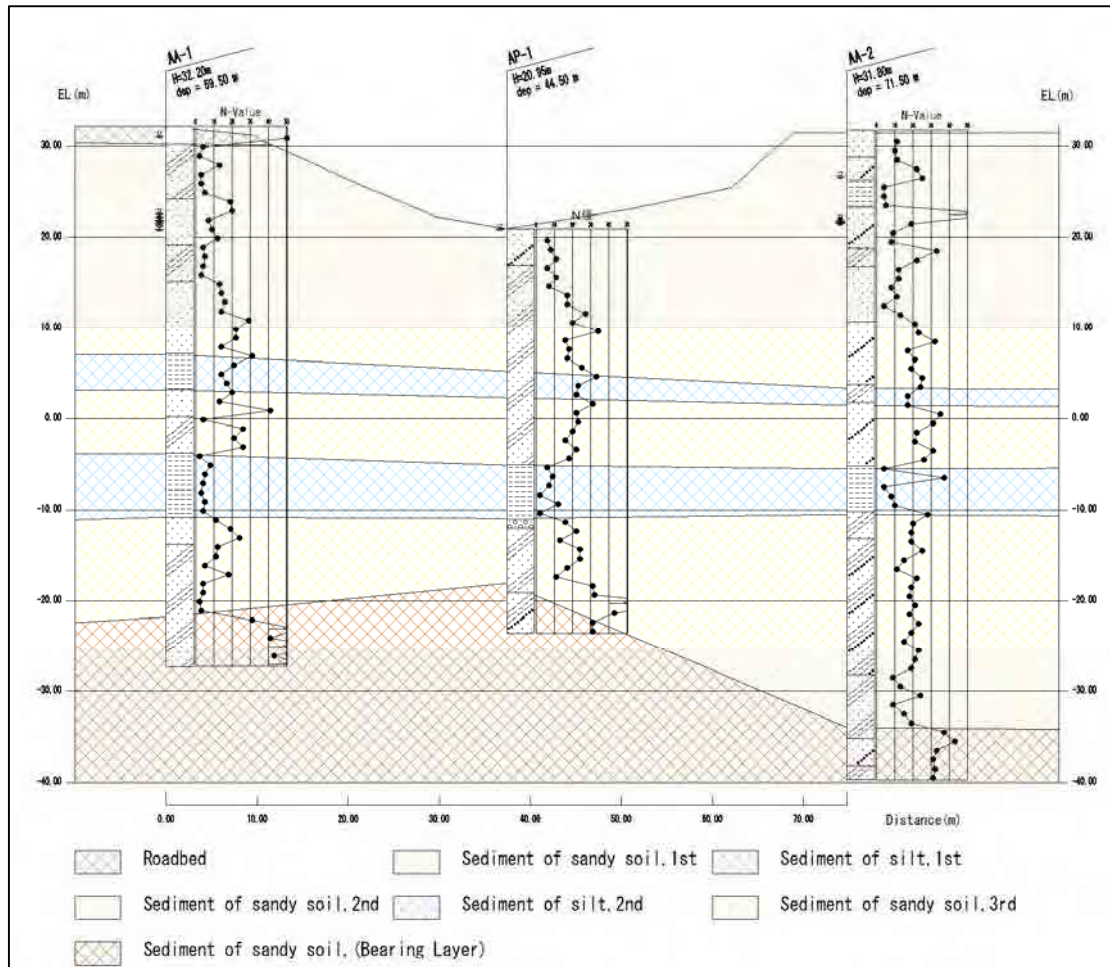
Projected Strata Cross Section - Aum Bridge
